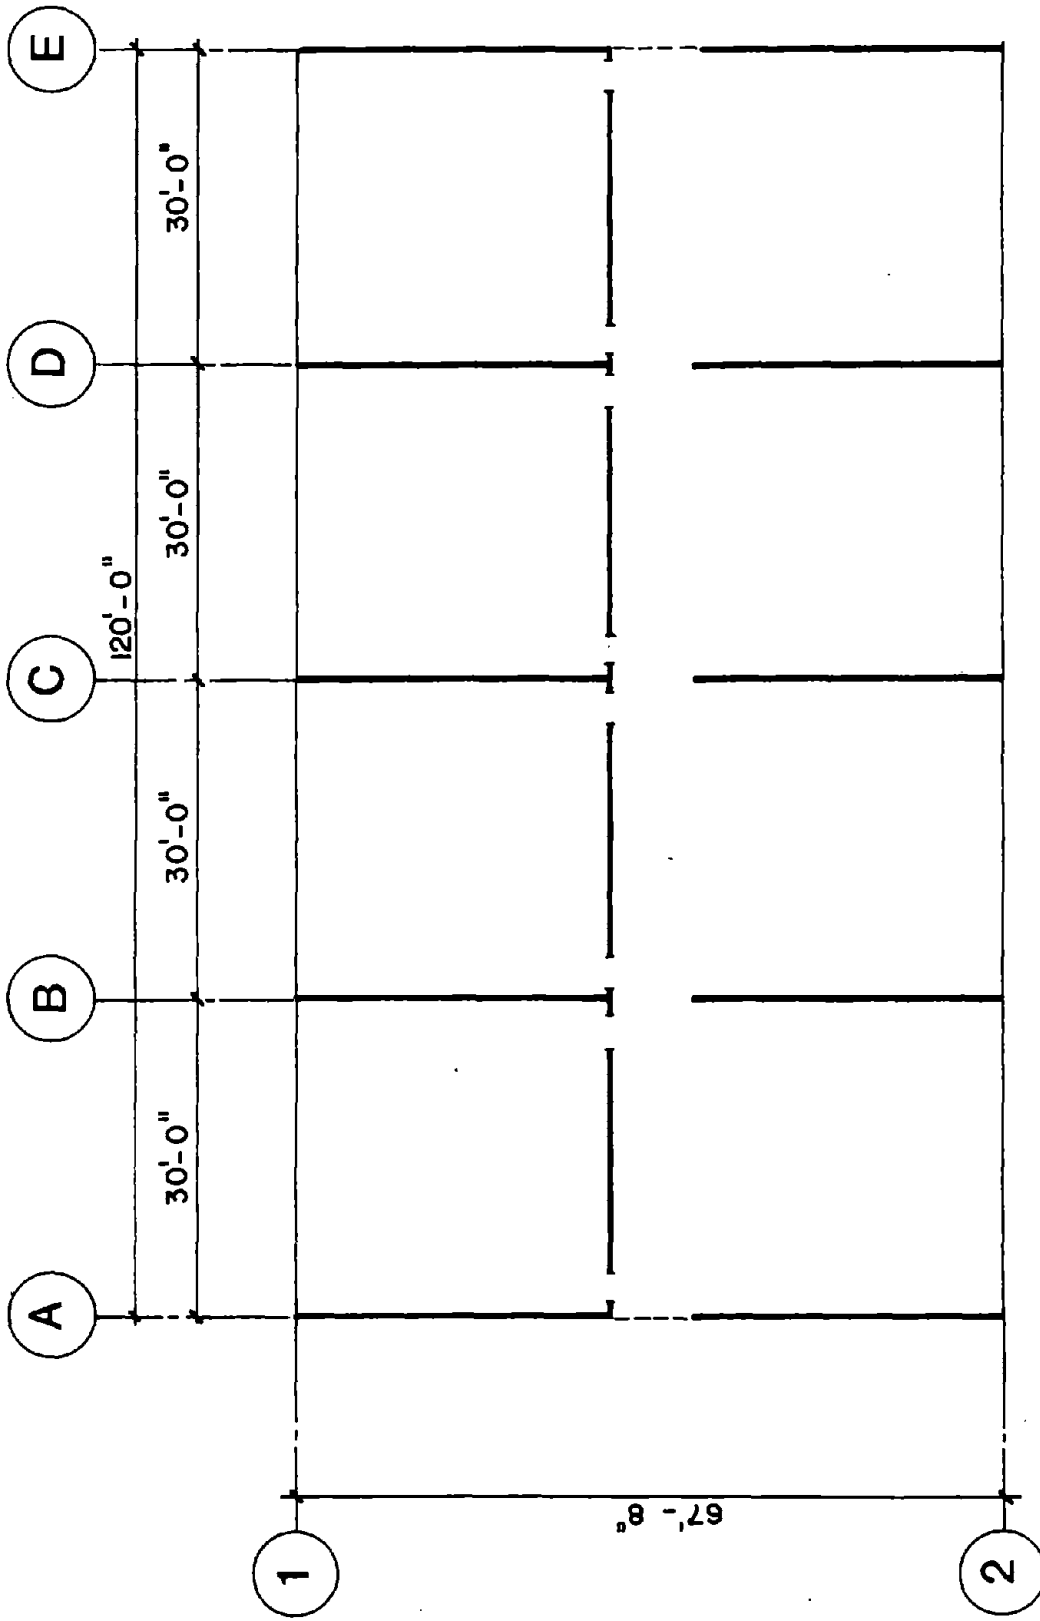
2ND, 3RD, & 4TH FLOOR PLAN
